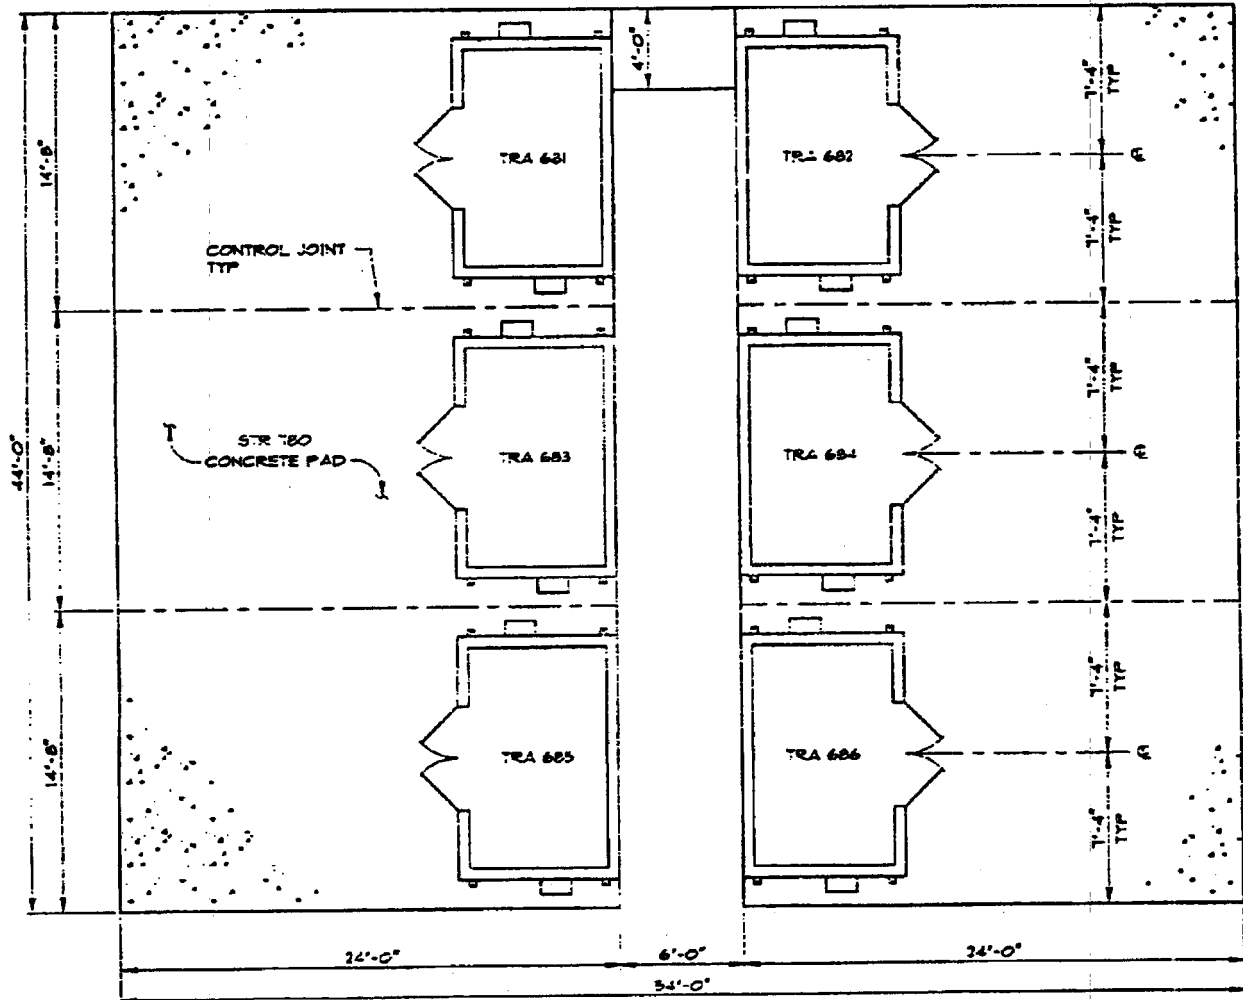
Layout and construction of TRA-780, 90-Day Storage Area.
